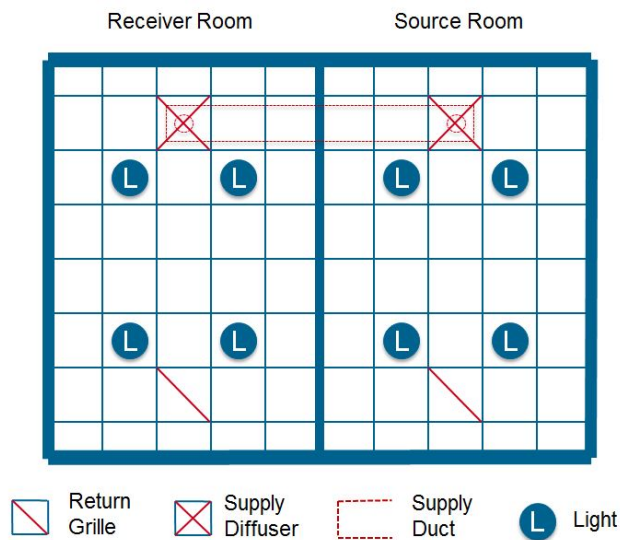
Reflected ceiling plan of the final ceiling system tested showing locations of the air distribution and lighting devices.
